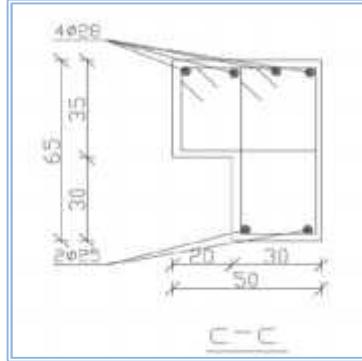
cross section for negative moment between span (#2) & (#3).
